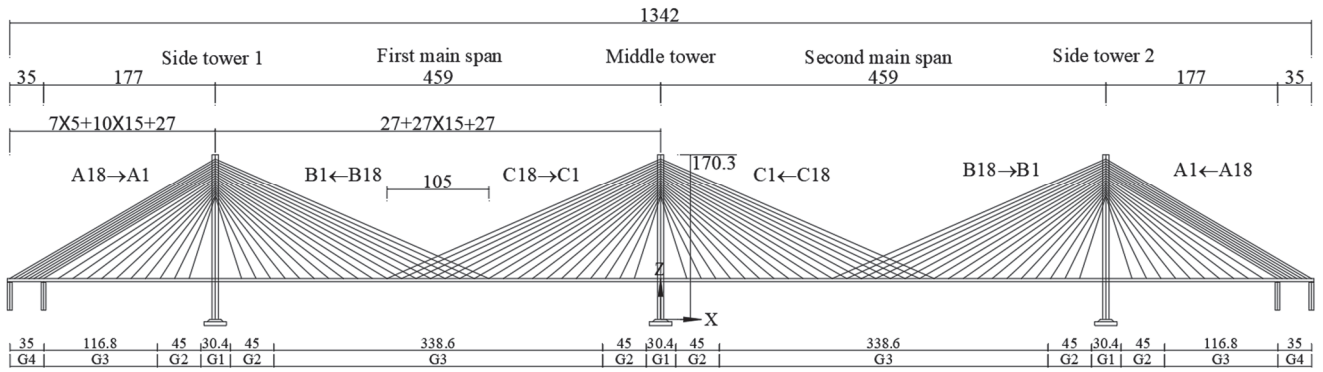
Schematic diagram of elevation layout of three-tower four-span cable-stayed bridge / m
